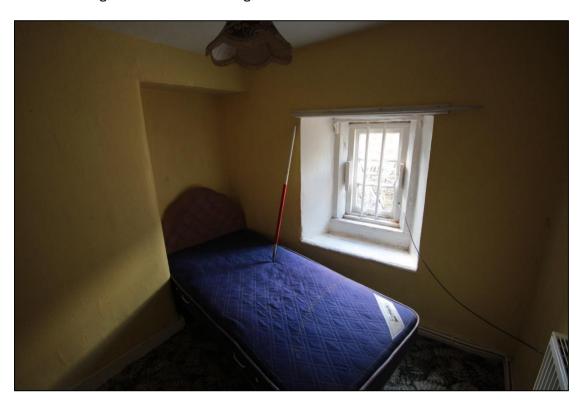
View of the small first floor bedroom to the north of the farmhouse, taken facing north with 1m scale.
